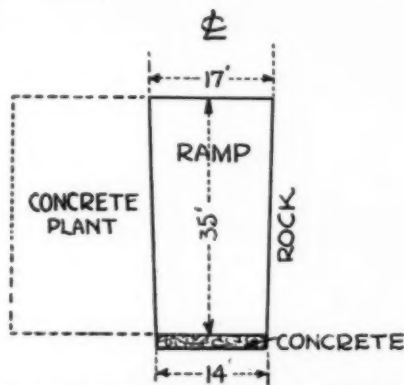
SECTION A-A, SHOWING A CROSS-SECTION OF RAMP
